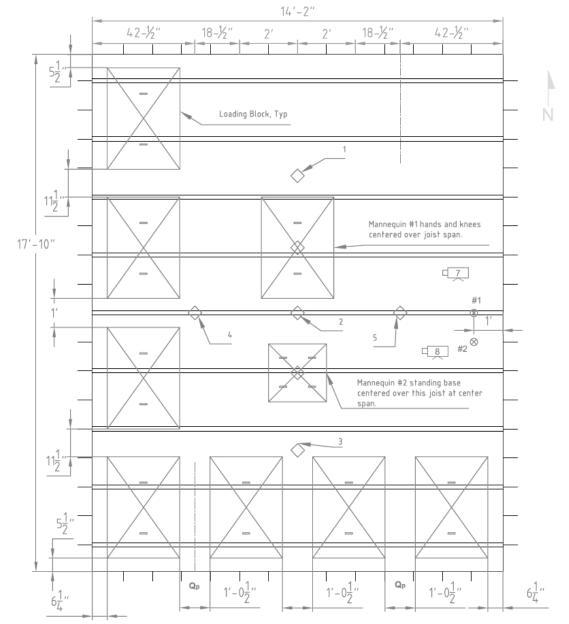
Loading and Instrumentation Layout (See Figure A.5.8).
